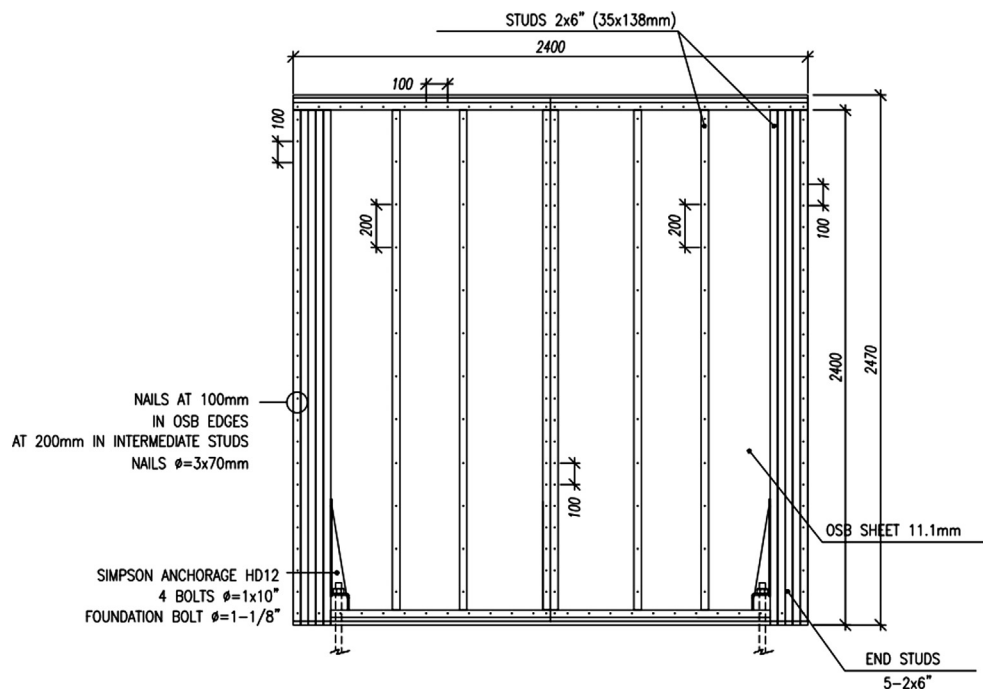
Configuration of a 2400 mm shear wall (lengths in millimetres).
